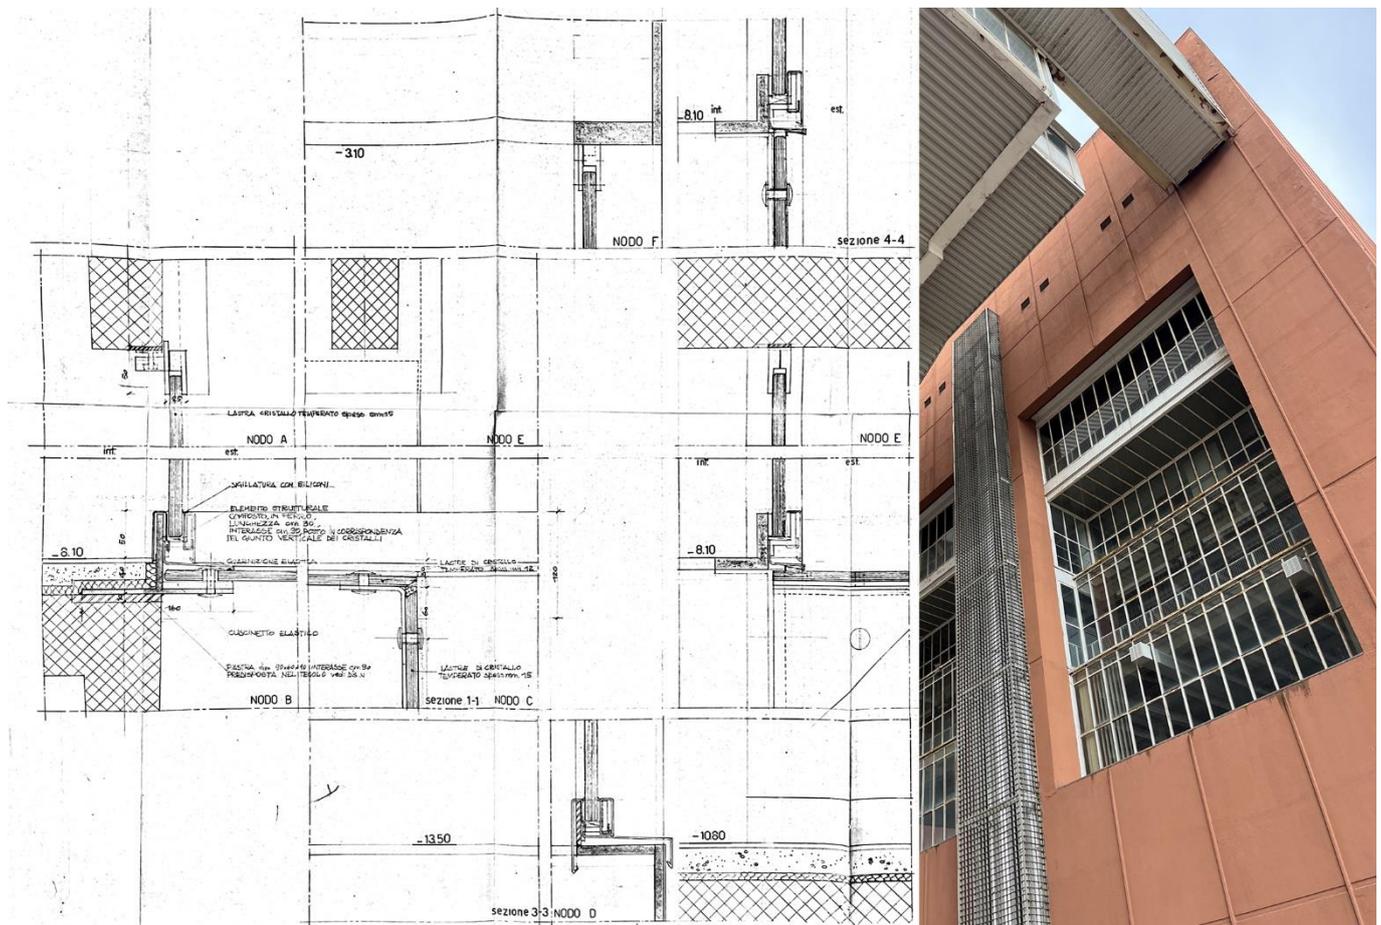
The terraced curtain walls that occupied a large part of the elevations, overlooking the square protected by the zig-zagged profile of the hall. Left: construction detail of the project, then modified during construction (source: Archivio Direzione Tecnica e Patrimonio Immobiliare Università della Calabria). In the current state (on the right) the original version is preserved (photo by the authors).
